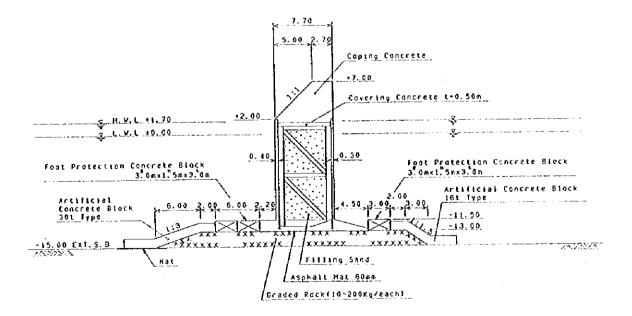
(4) Typical Cross Section of Breakwater 2 (Hybrid Caisson)
